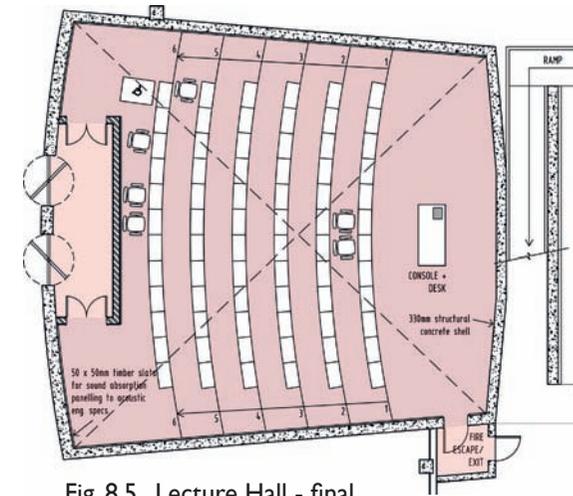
Lecture Hall - final plan design (Author, 2011).
